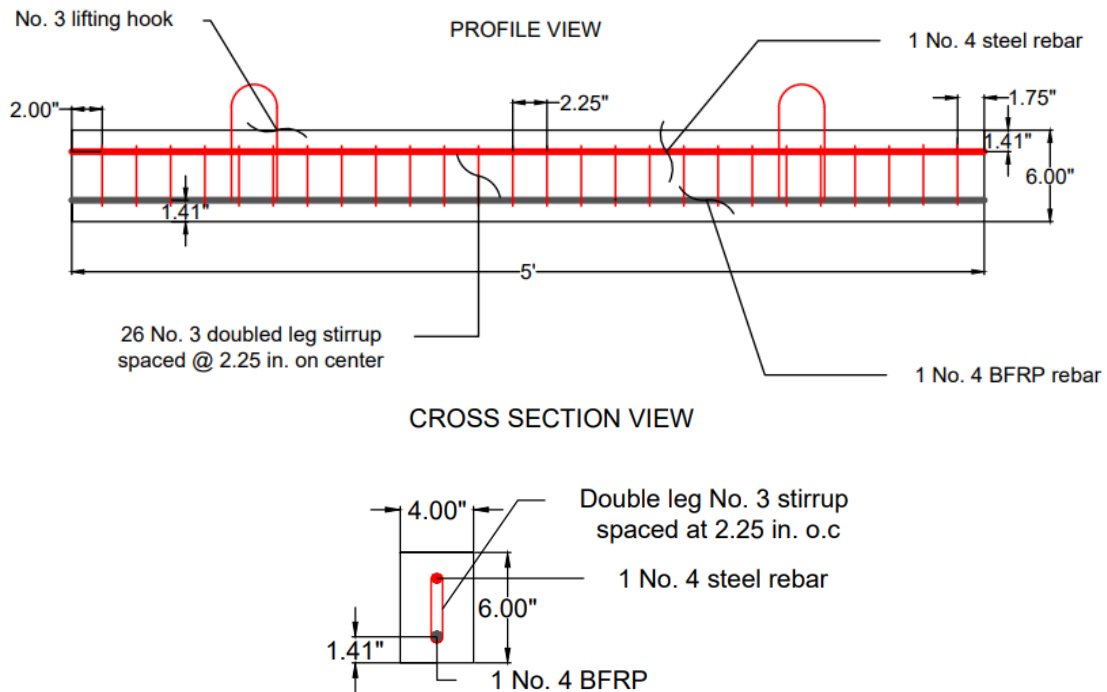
Reinforcement details for the nonprestressed BFRP concrete beam
